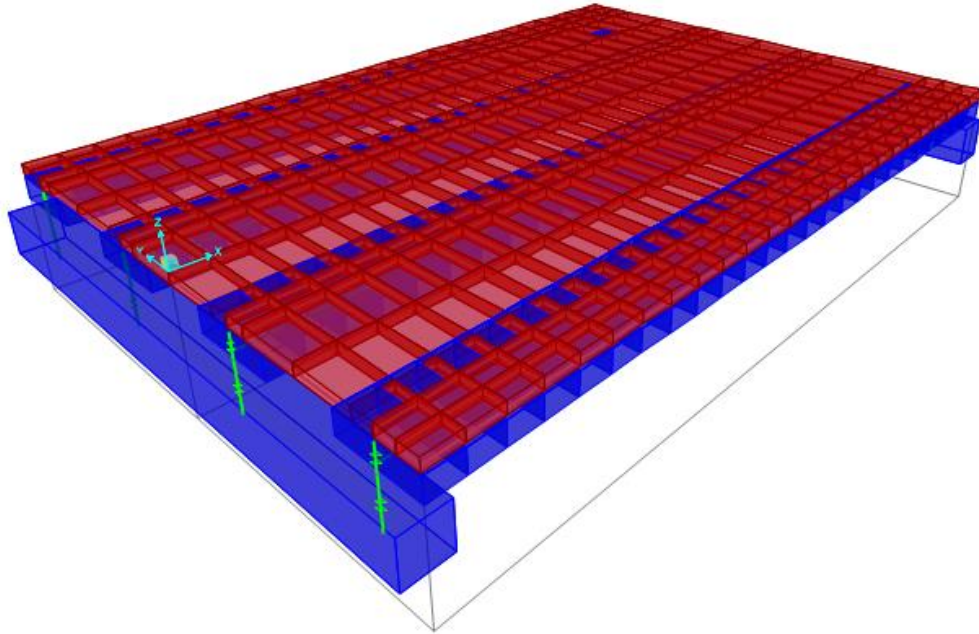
Riverside Bridge Frame Element Model (Hueste et al. 2014)
